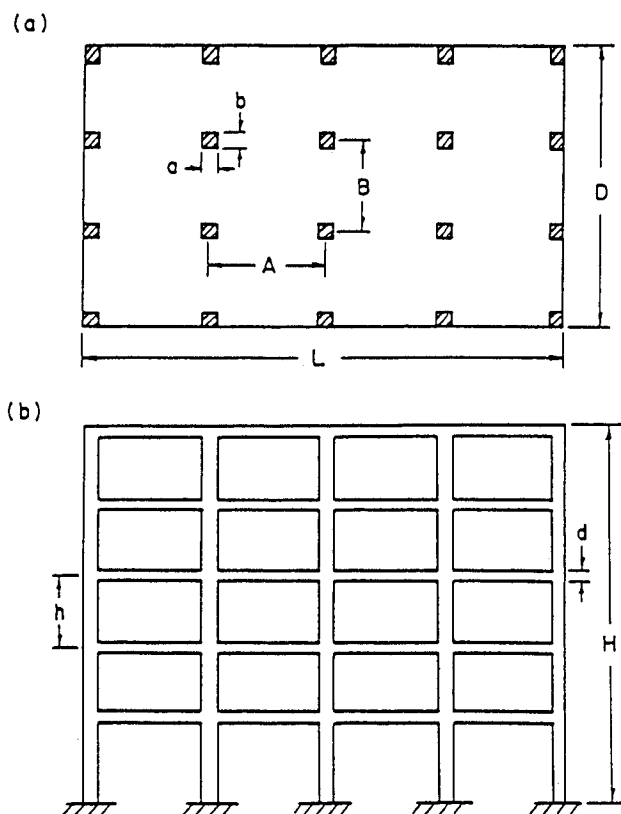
Moment-Resistant Frame of Building: (a) Horizontal Cross Section; (b) Vertical Cross Section
